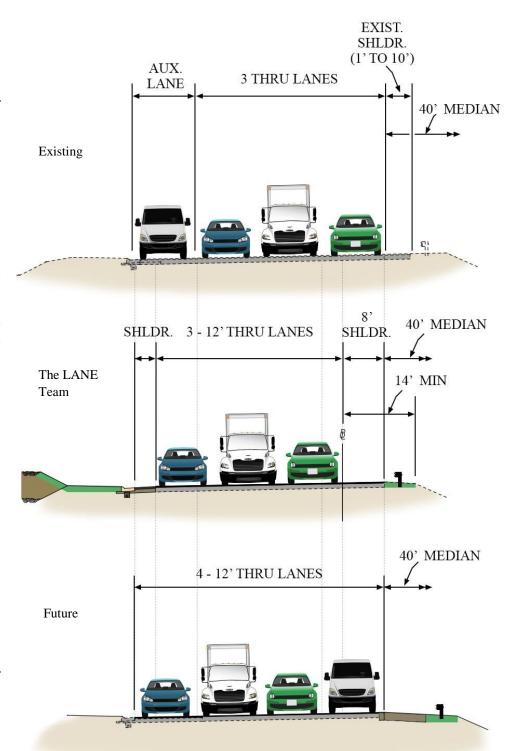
The LANE Concept establishes the outer shoulder in the same location needed for the Future Widening of Route 7. This allows the pavement, curb and gutter, stormdrain systems, and retaining walls to be built in the LANE Concept in their future locations.
